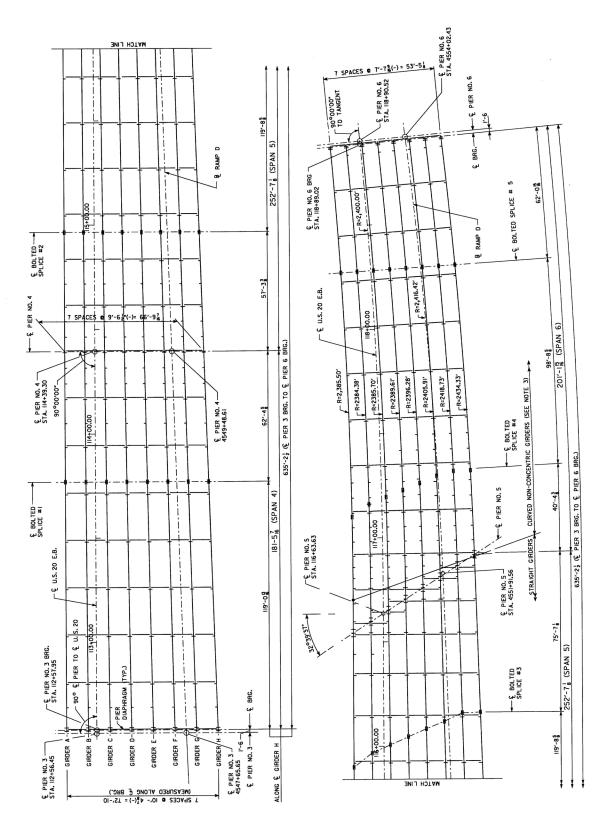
U.S. 20 Eastbound Iowa Approach Bridge Framing
